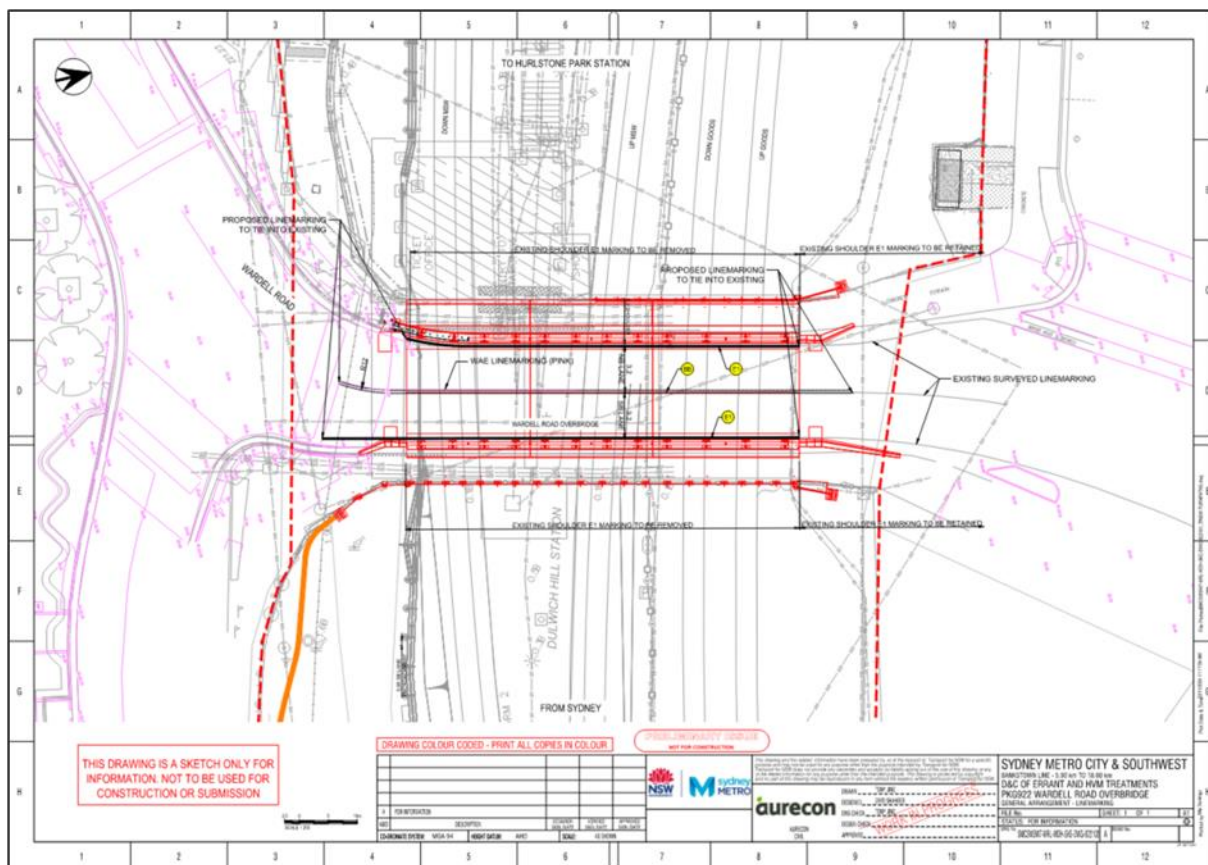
proposed delineation on Wardell Road overbridge between Dudley Street and Bedford Crescent.
